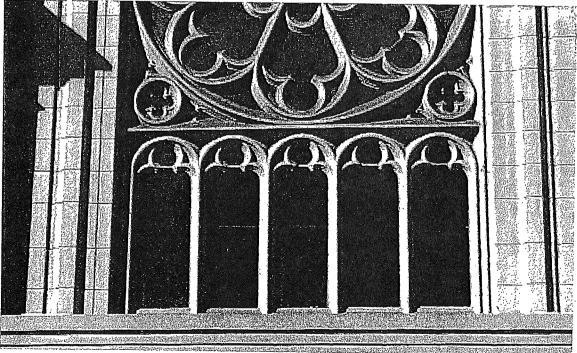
West transept rose window after restoration. (Palisade Builders, 05/20/2018)
